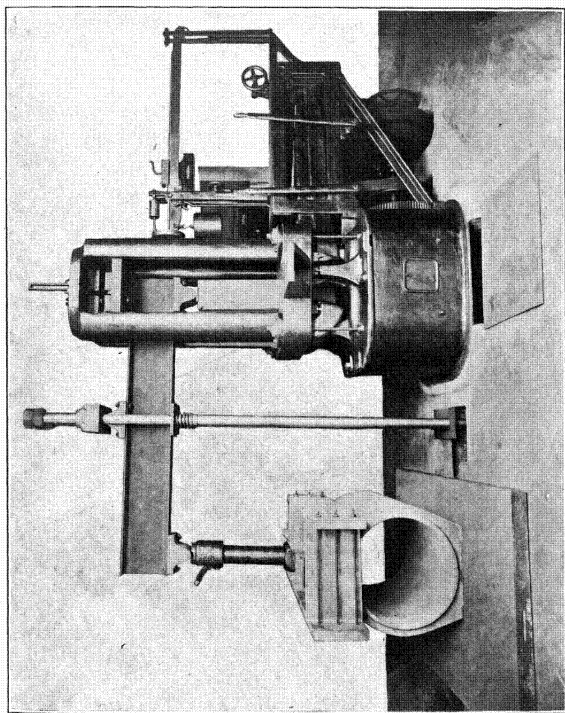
PLATE XLVIII. TESTING MACHINE BREAKING CONCRETE PIPES.
